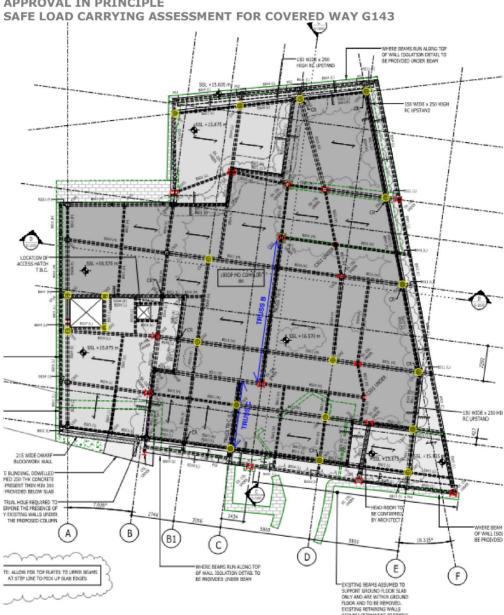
Extract from drawing 61018885-01-S1001 (included in Appendix A) Ground Floor GA. Columns highlighted yellow are not directly above existing structural beams, trackside columns or retaining walls. Columns in red start at the floor below and terminate at ground level. New trusses highlighted in blue.
